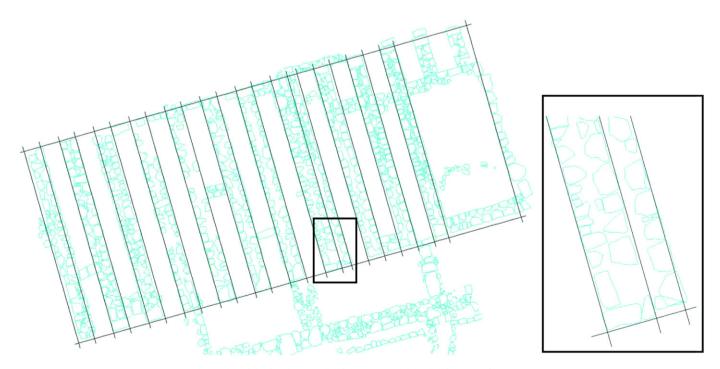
Plan of the foundation walls of the granary and details of their reinforcement.
